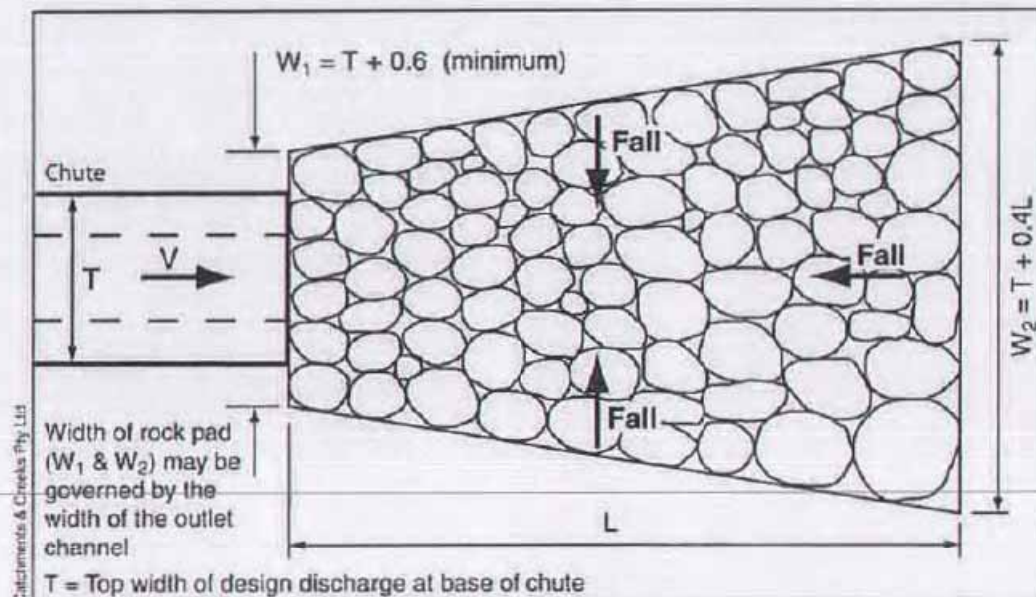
Typical layout of a recessed rock pad for a chute (plan view)
